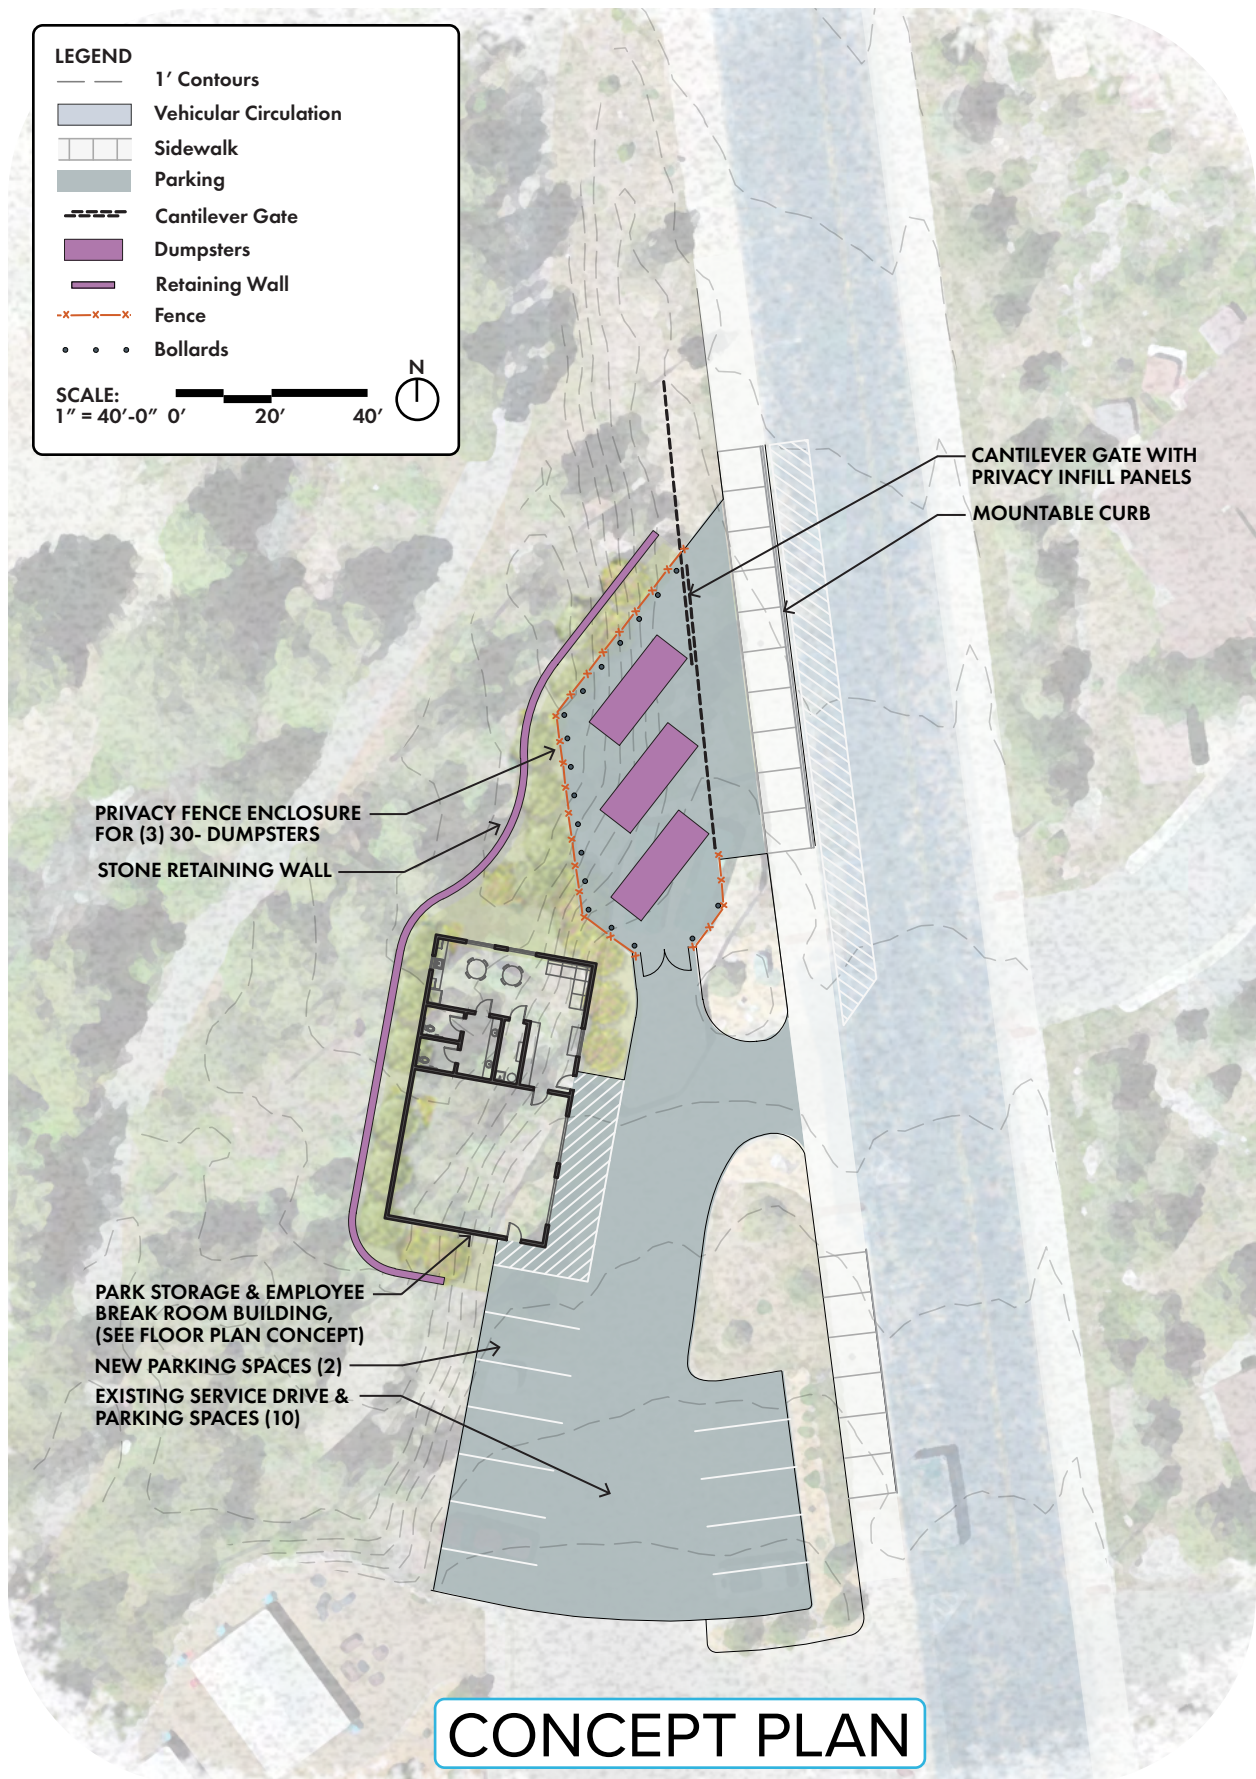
Concept site plan for Operations and Maintenance Building north of the Rendezvous Events Center in Hideaway Park.
